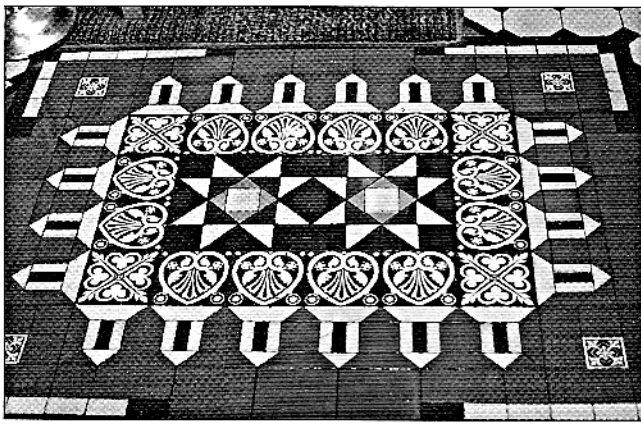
The centrepiece of the first floor tile installation. The large encaustic tiles measure 6 inches by 6 inches. The corner tiles match a known Maw design.
